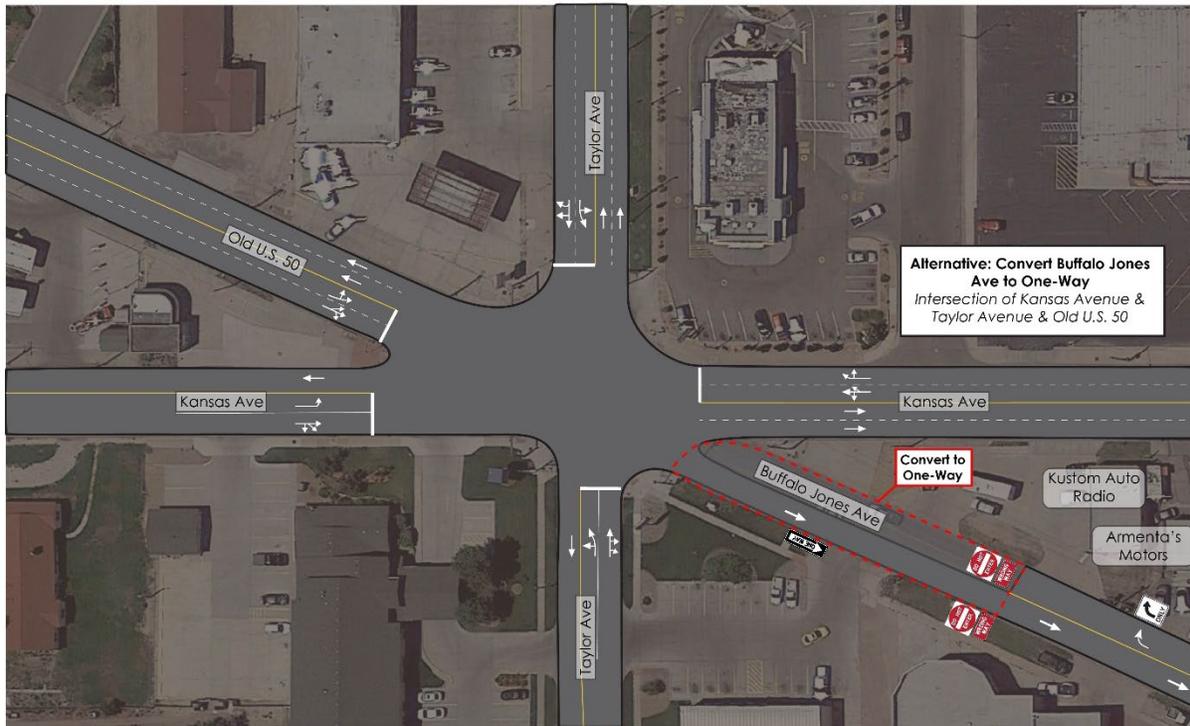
Conceptual design of the intersection alternative converting Buffalo Jones Avenue to a one-way street
